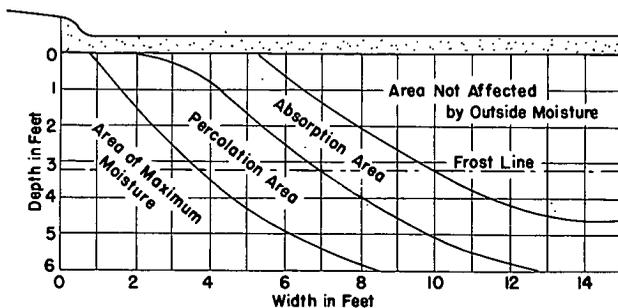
Distribution of Moisture Prevailing in Unprotected Clay and Loam Subgrades. (After Lowell)
